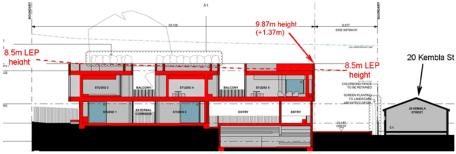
Section showing height of building & maximum 8.5m LEP Height
